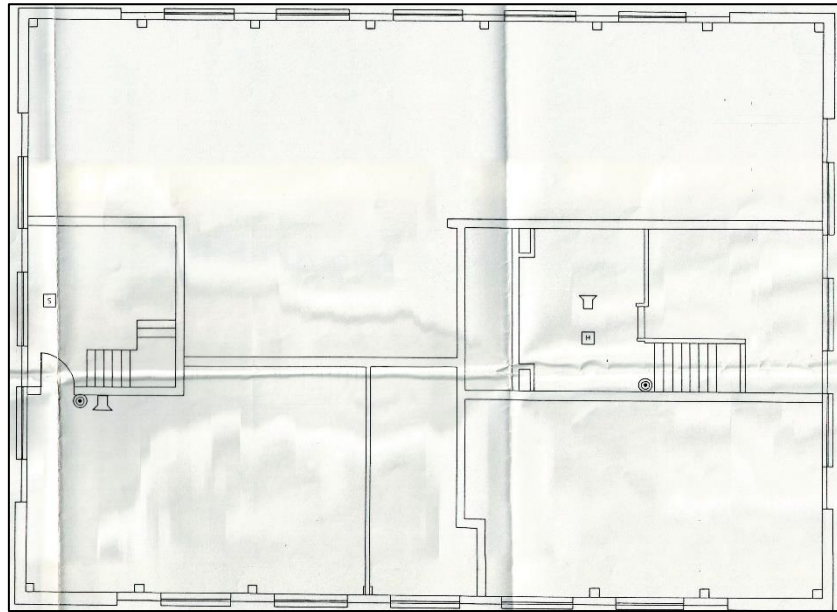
1994 plan of the sixteenth floor, not to scale (J.E.Greatorex & Partners)
